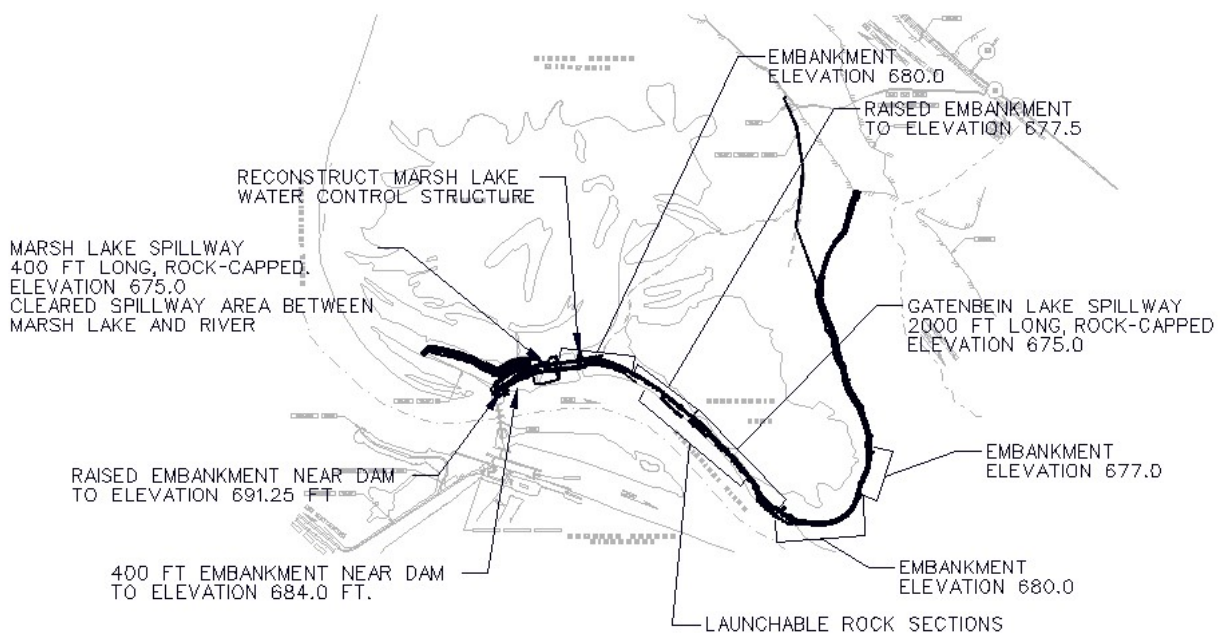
Alternative measure E3 reconstruct lower embankment.
